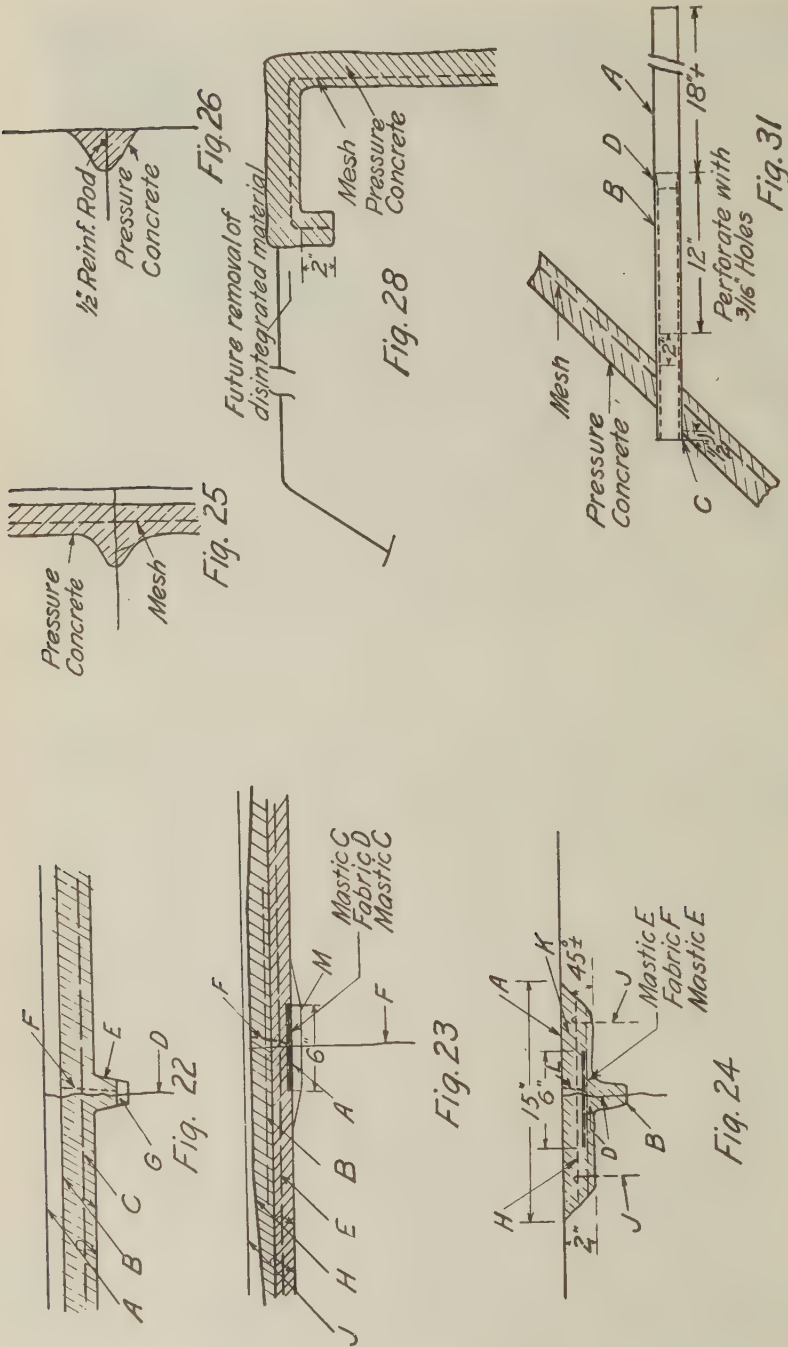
, 23, 24 (LEFT) AND FIG. 25, 26 AND 28 (RIGHT)—JOINT AND CRACK DETAILS—SEE TEXT
